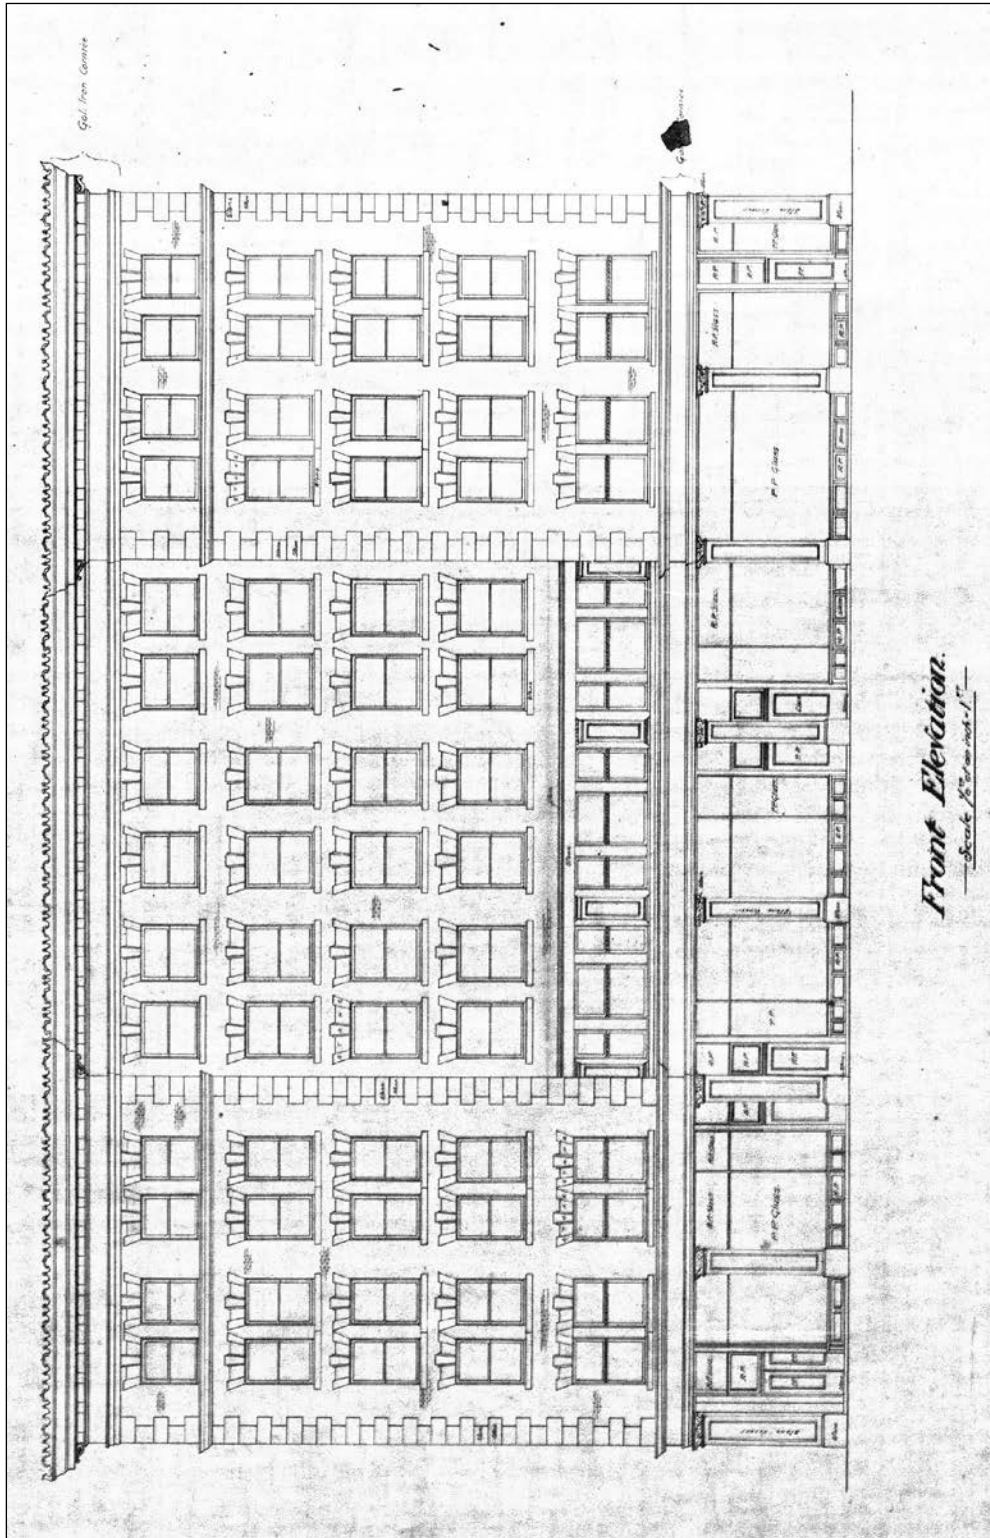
Somerset Building, Portage Avenue, Architect's Plans, "Front Elevation," 1906.
